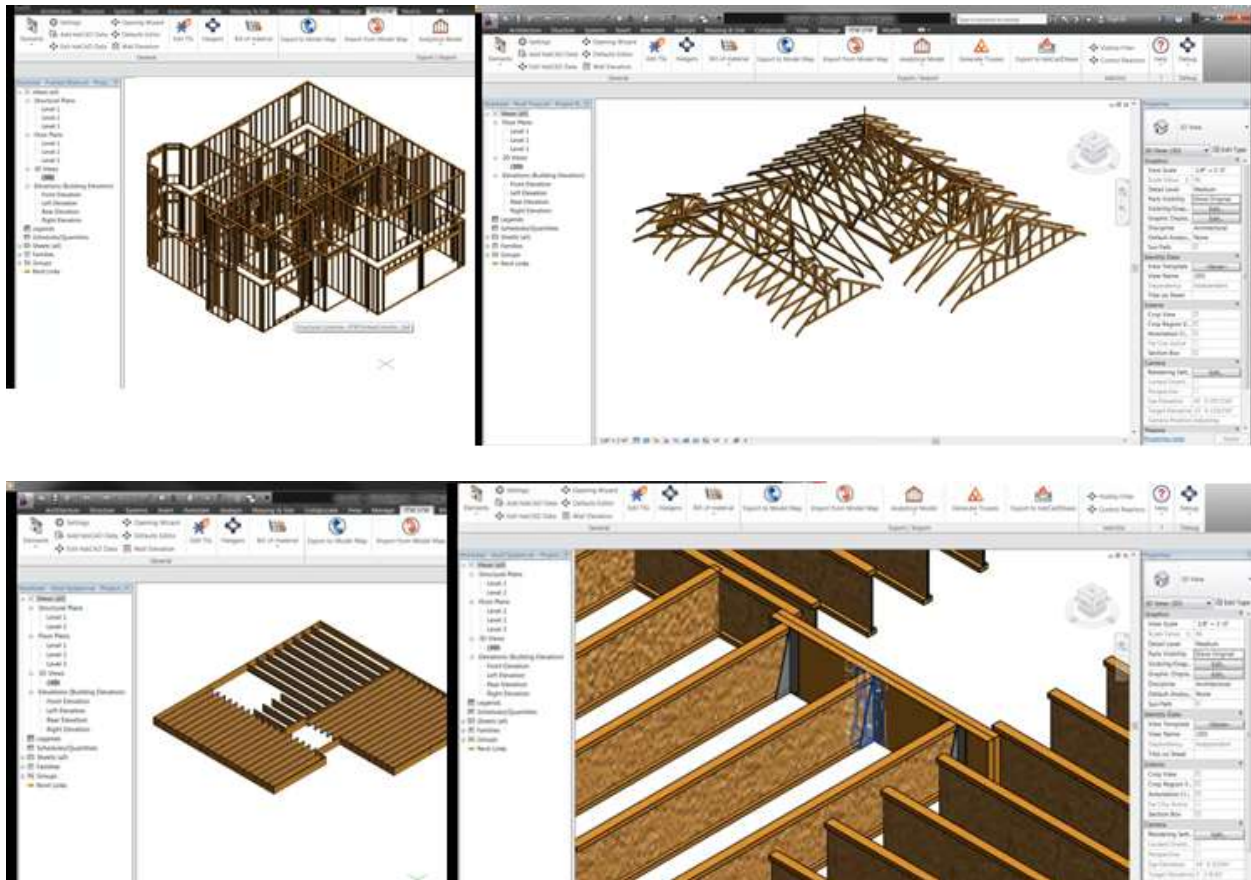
Open BIM-enabled I-Joist (EWP) Solutions share the same model as trusses and wall panels
